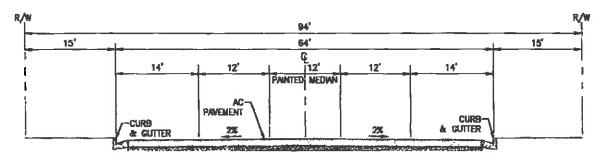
Western Way Typical Cross Section (Ultimate)
